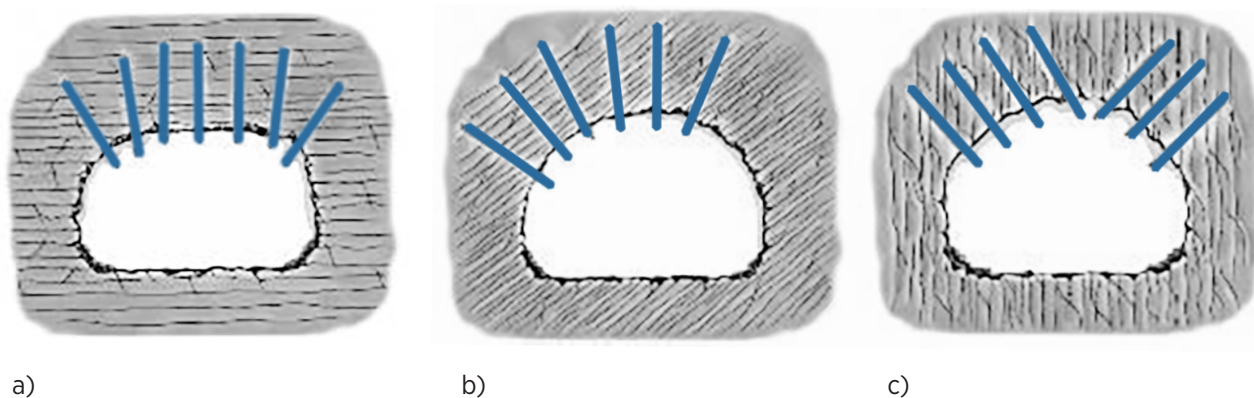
Example of the use of bolts and sprayed concrete in heavily fractured rock
